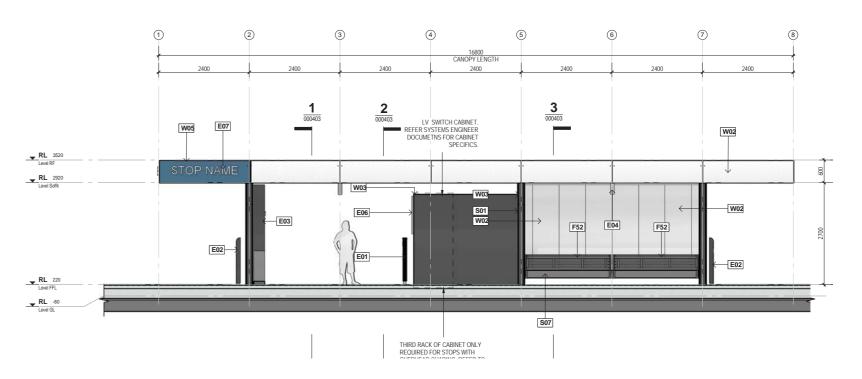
Typical narrow centre stop shelter elevations (Architectural drawing SYS-ARC-TA-DRG-00303)
